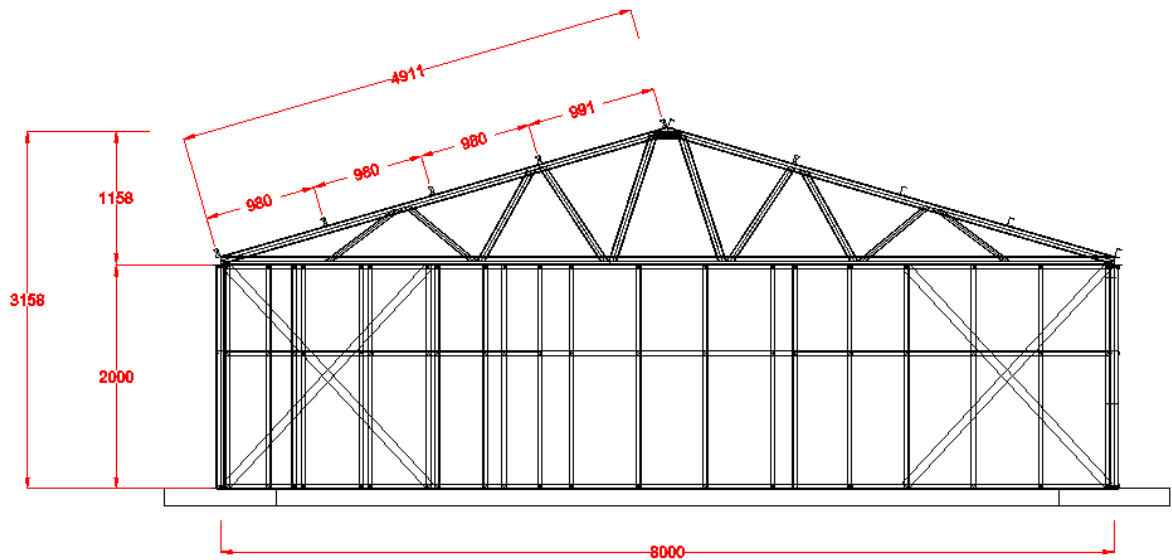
Details of Test Frame (All Dimensions in mm)
